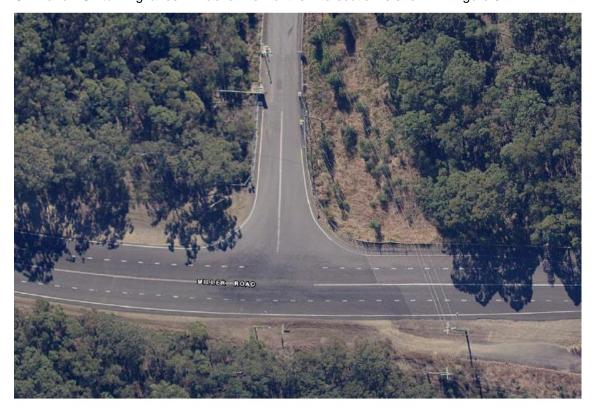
Intersection of Miller Road and Newstan Colliery Surface Site
